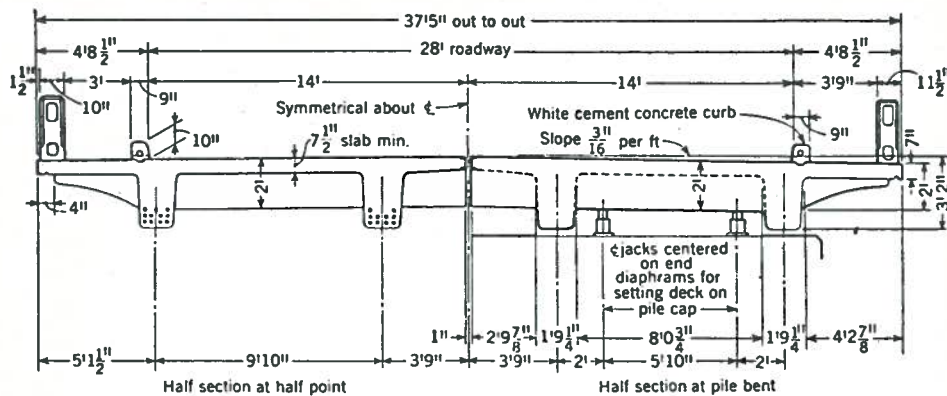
The original precast reinforced concrete trestle for the Lower Tampa Bay Bridge consists of a precast deck divided along center line into two identical sections. The deck is erected on four-pile precast concrete bents spaced 36 ft on centers. For contrast see Fig. 25.
